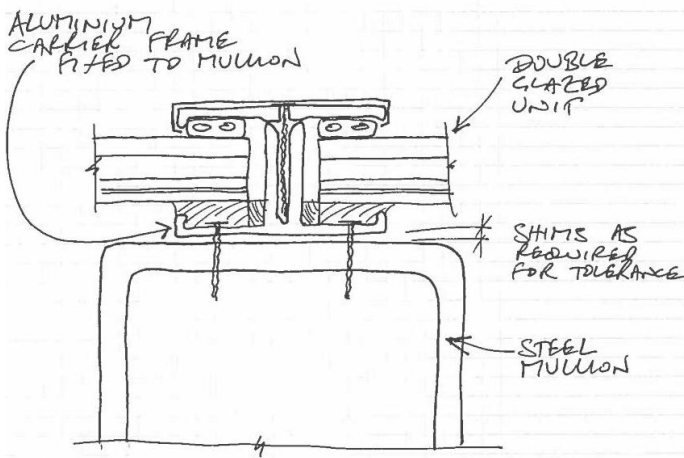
Indicative sketch of carrier frames to fitted to the front of steel box sections
